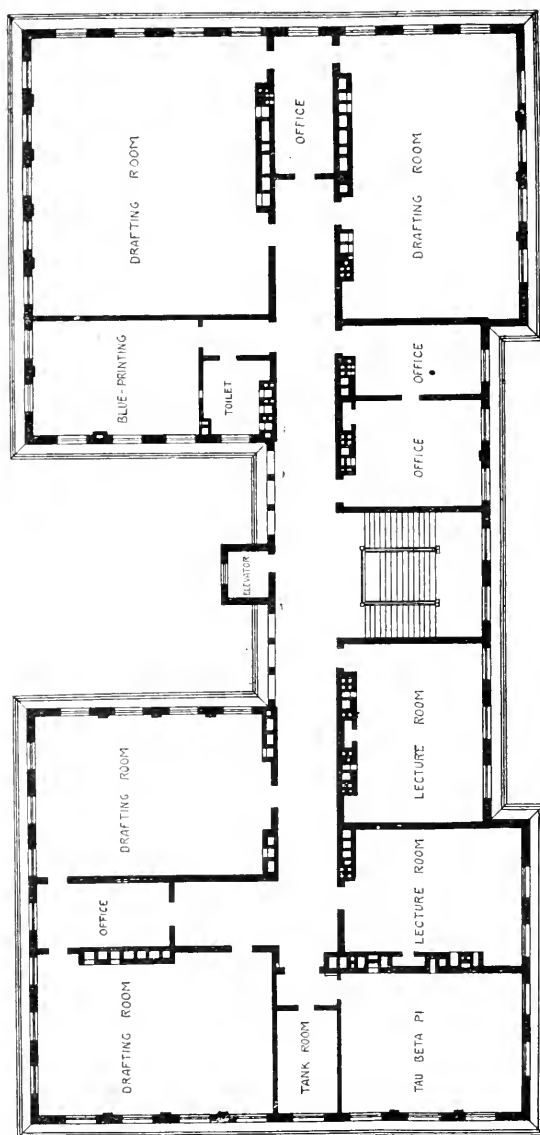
FOURTH FLOOR PLAN OF THE R. E. OLDS HALL OF ENGINEERING.
